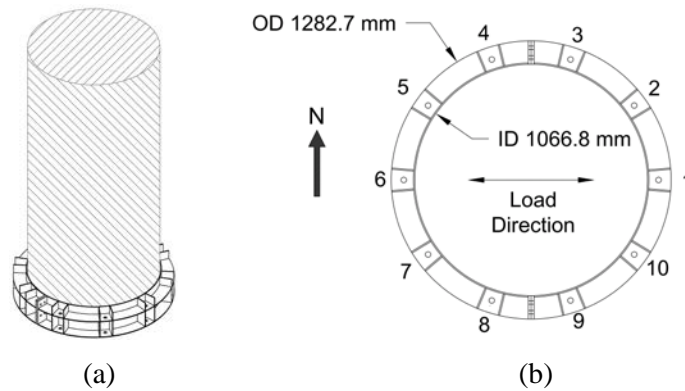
Anchored Cask: (a) Clamp Assembly with Cask; (b) Clamp Assembly Plan View
